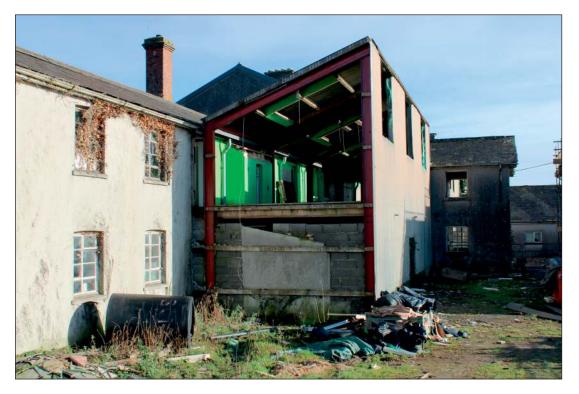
The south elevation at the west end of the central range showing 1970s addition and link to the south range beyond, looking east
